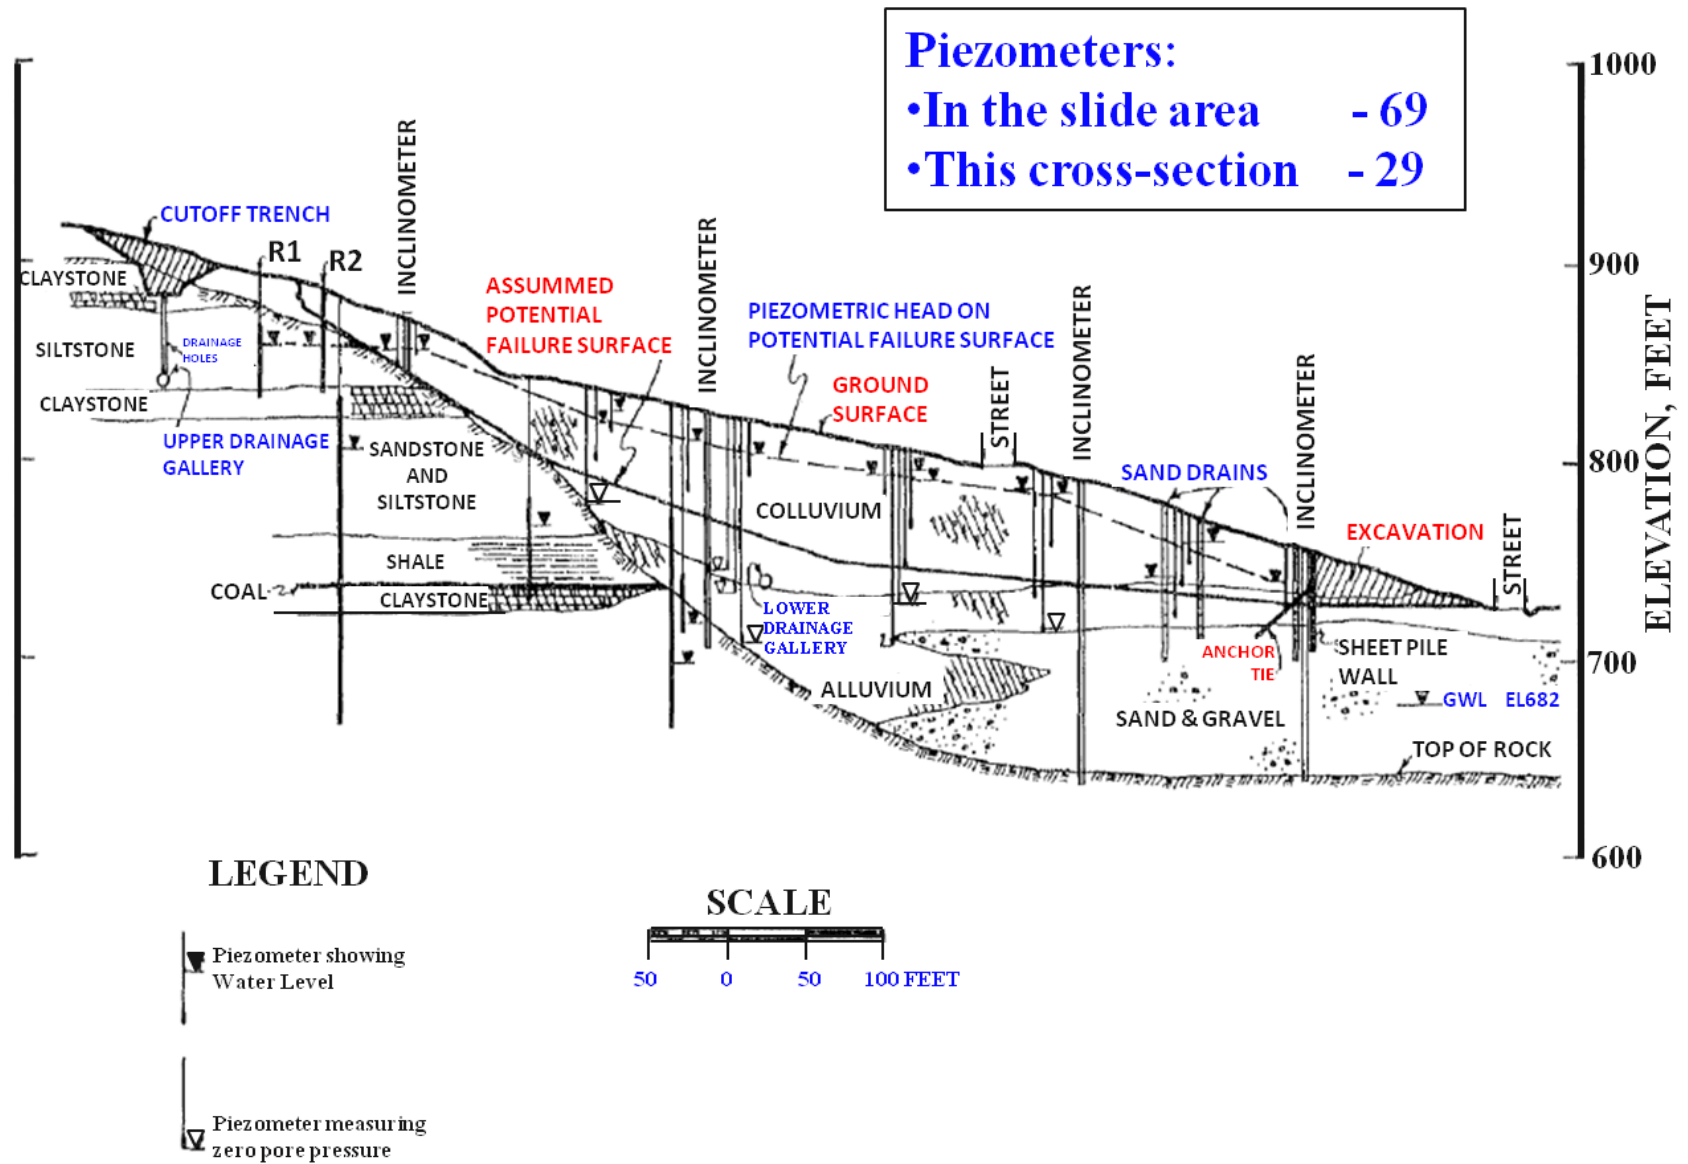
Cross section of slope showing instrumentation, excavation and potential failure surface (from D'Appolonia et al. 1967).
